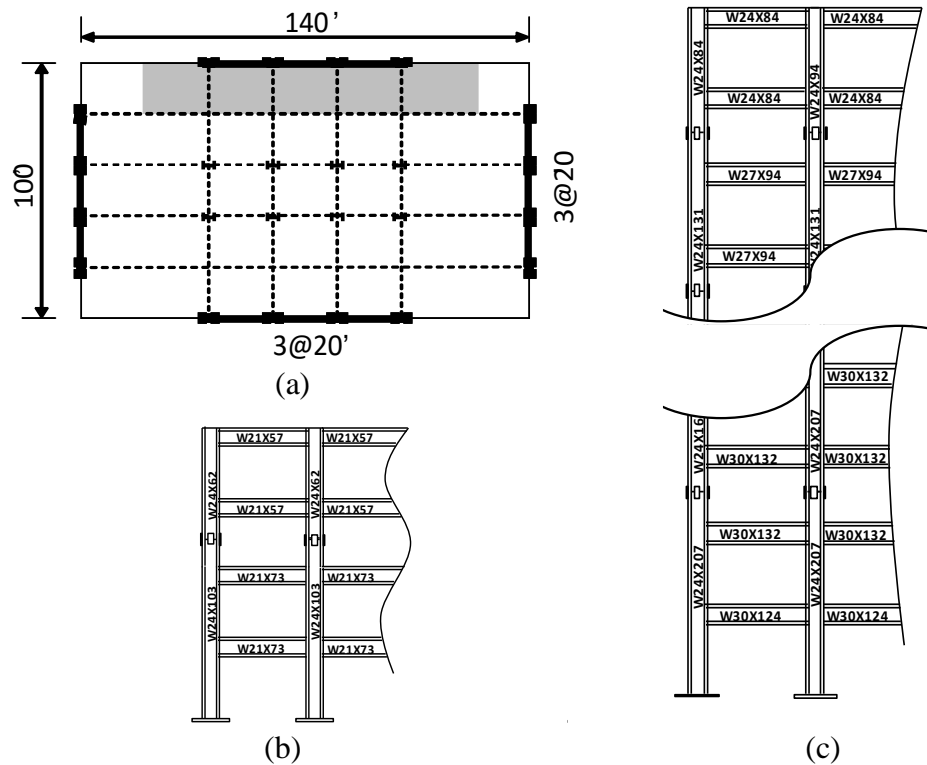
1. Elevation (a), plan view of 4-story (b) and plan view of 20-story (c) of steel moment frame model
